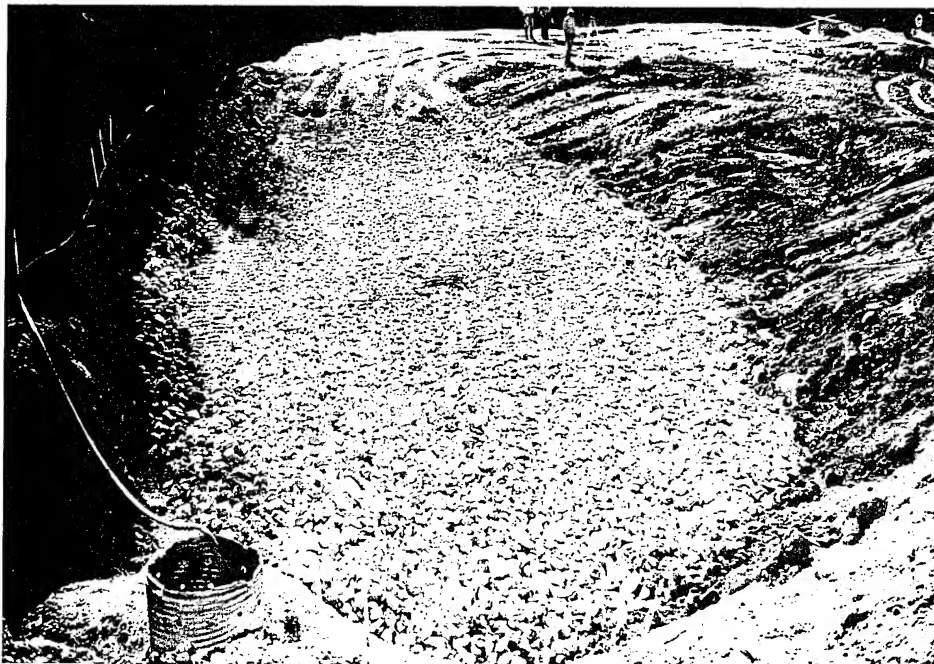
The foundation at the downstream right corner of the diversion structure as approved.
